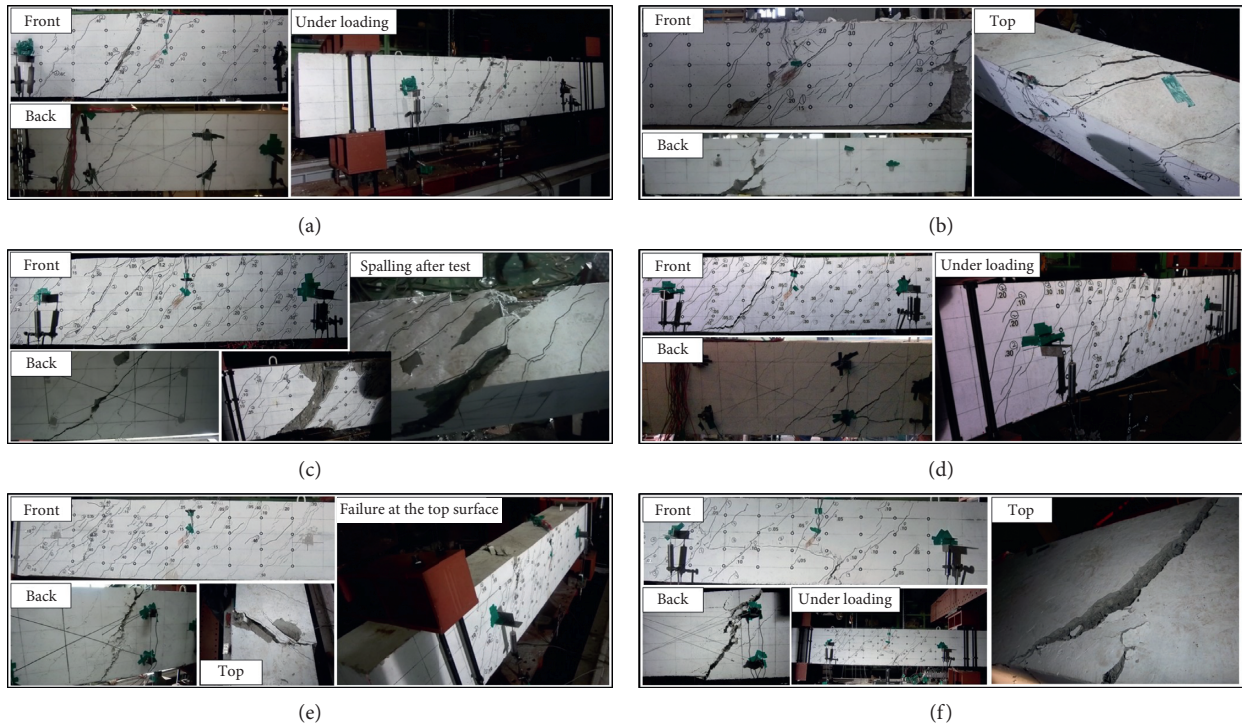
Crack pattern and failure of specimens: (a) MT30-0.77; (b) MT30-1.32; (c) MT40-1.32; (d) MT40-1.89; (e) MTF25-0.77; (f) MTF25-N.
